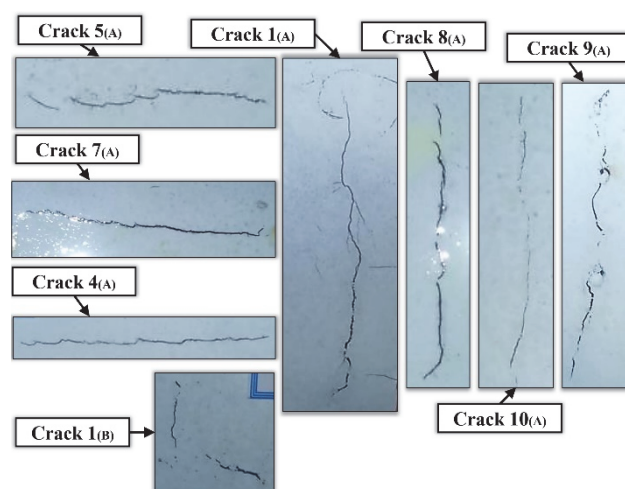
Appearance of some detected cracks/defects on internal pipeline wall
